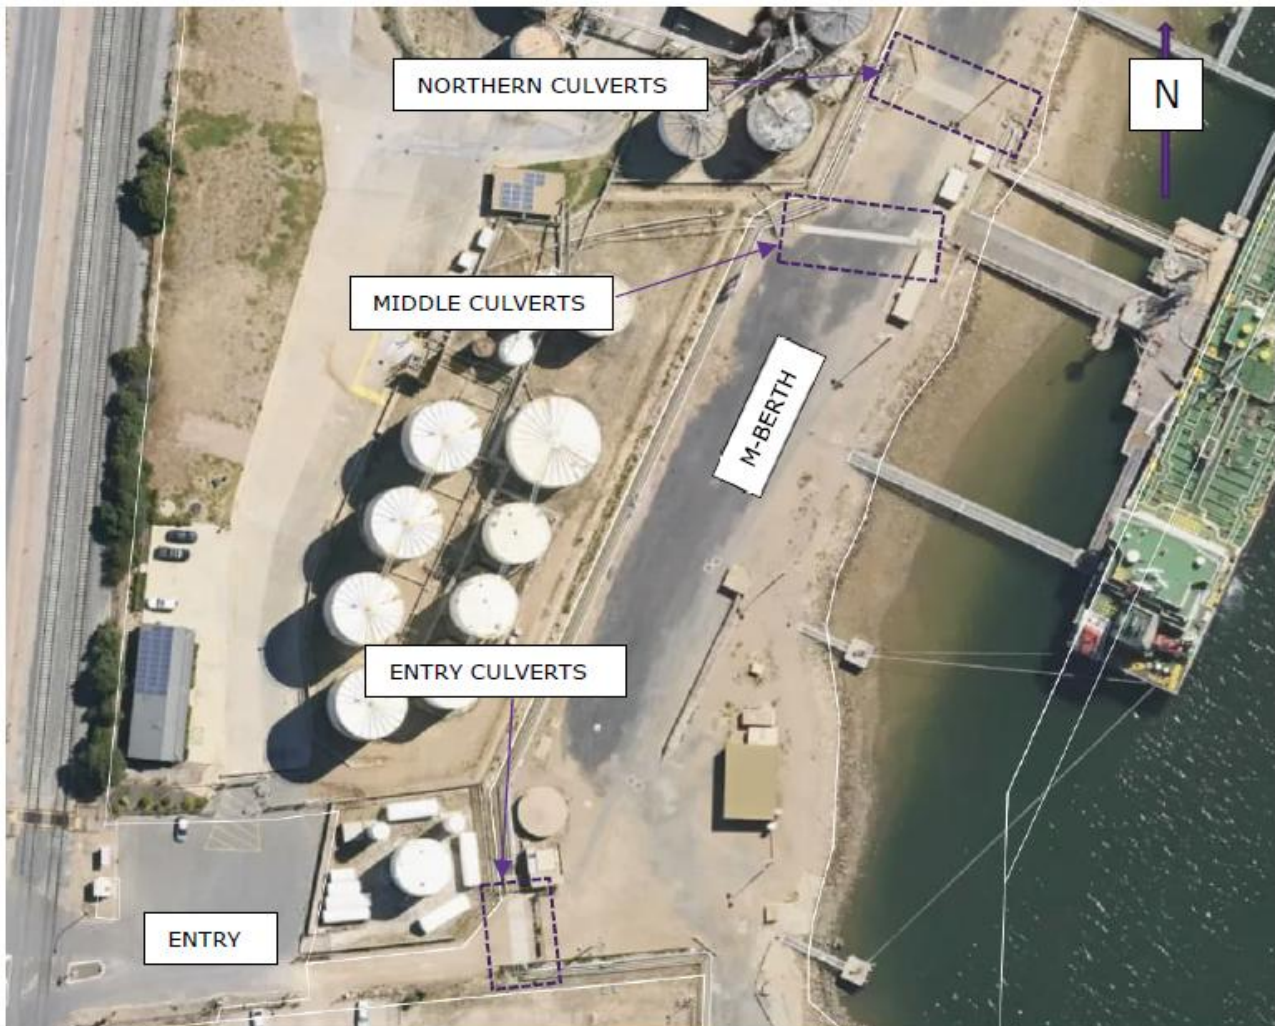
M Berth – plan view locating the three sets of culvert boxes
